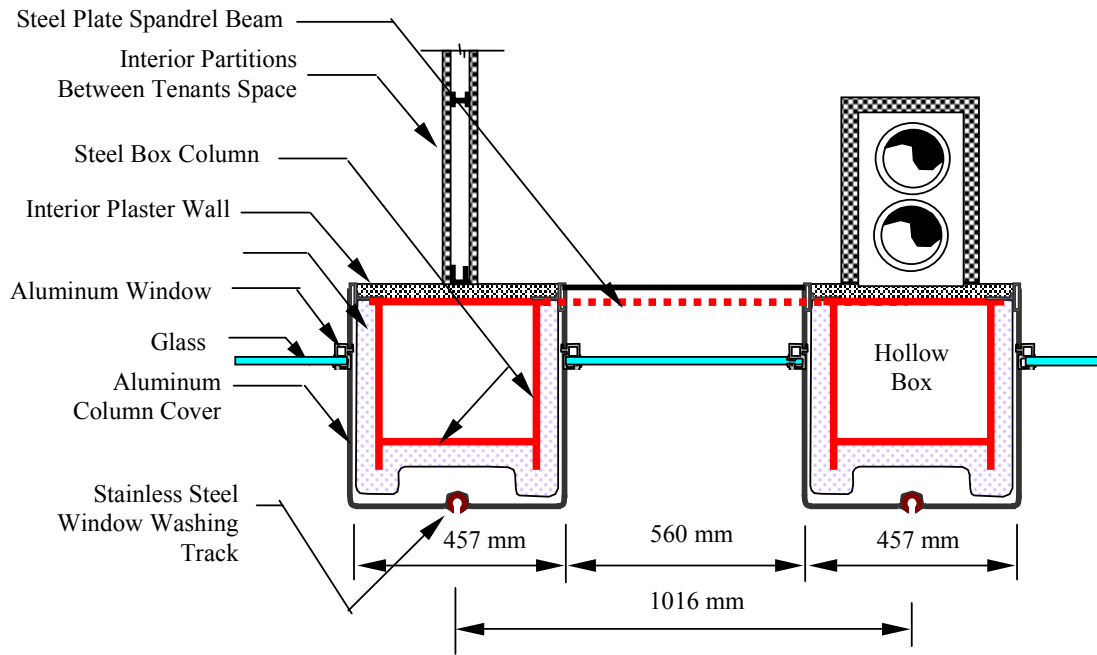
A Representative Architectural Plan View (96th Floor of the North Tower) (Ref: Astaneh-Asl, 2002b)
